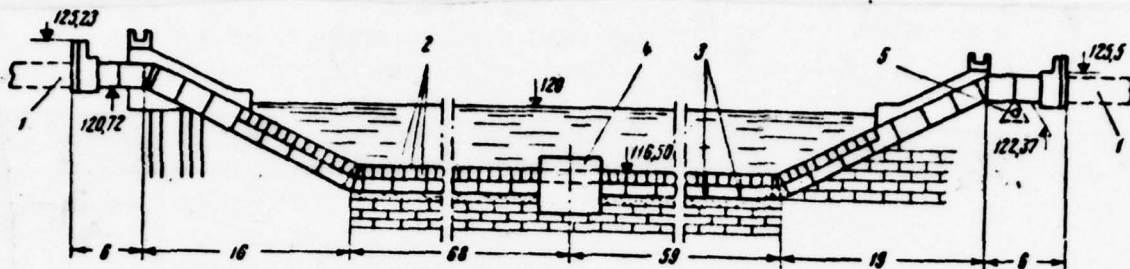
schematic longitudinal section of inverted siphon. 1 - reinforced-concrete tunnel; 2 - cast iron overlaid semirings; 3 - stiffening rib; 4 - concrete fixed support; 5 - roller bearing.
